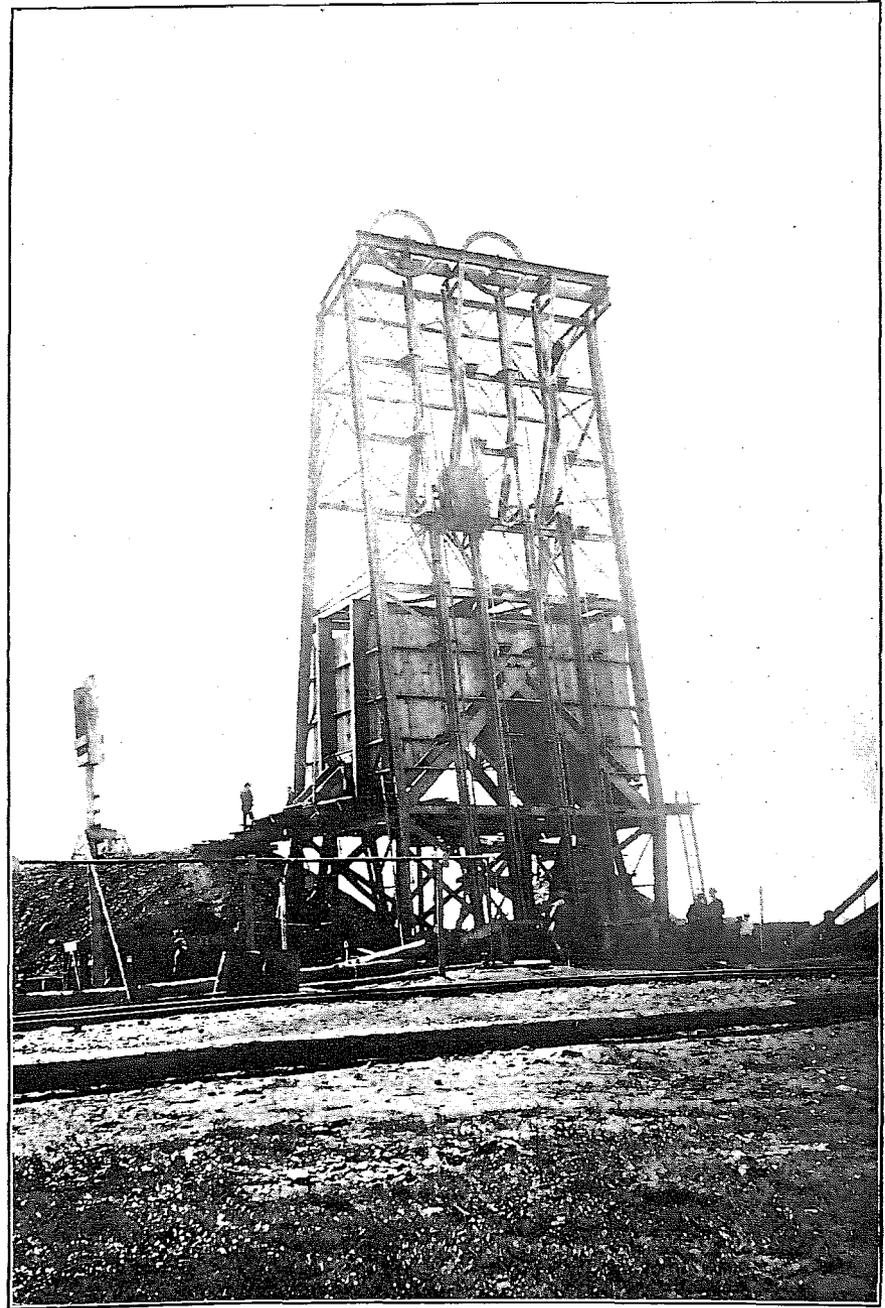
PLATE IV.—STEEL SHAFT HOUSE, ADAMS MINE, FIRST ON THE MESABI RANGE.
